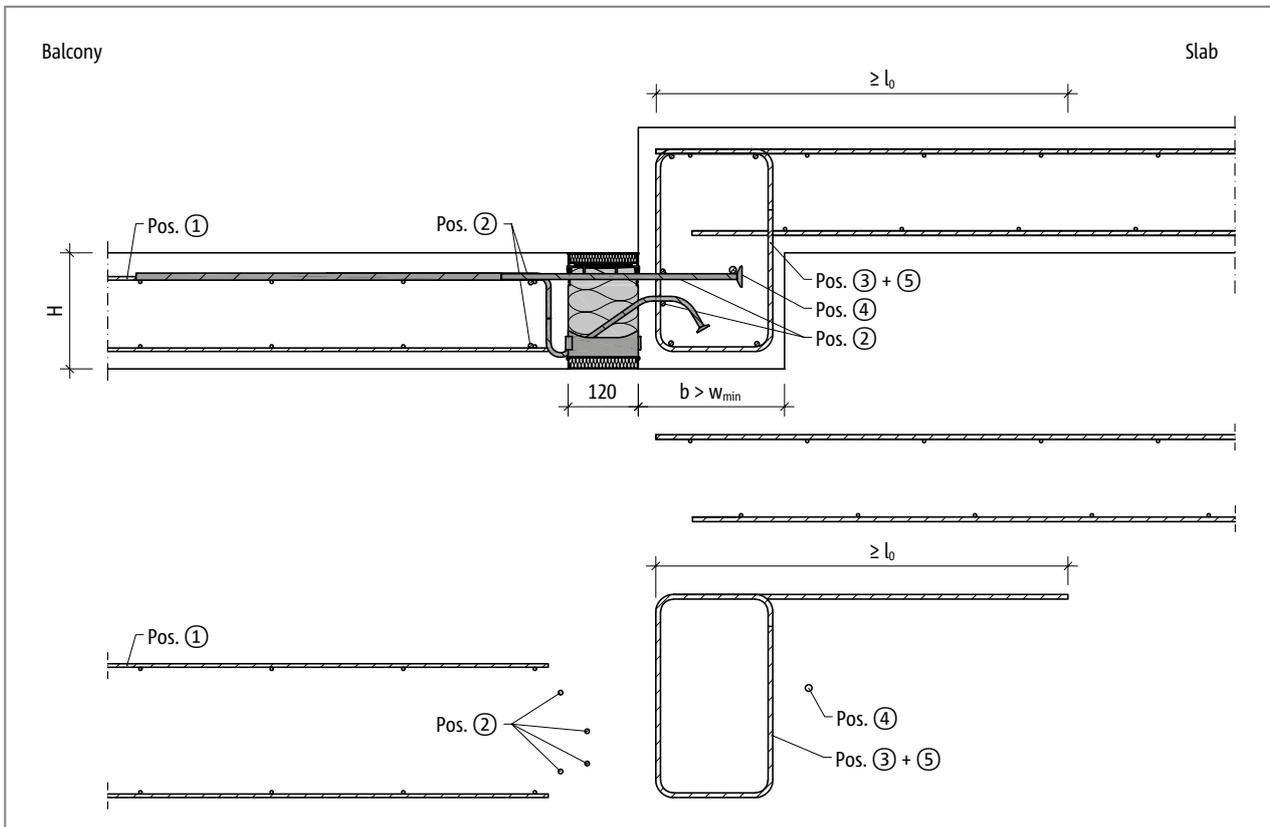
Schöck Isokorb® XT type K-U: On-site reinforcement for balcony with height offset downwards with larger structural element dimension ($w_{vorh} > w_{min}$)
